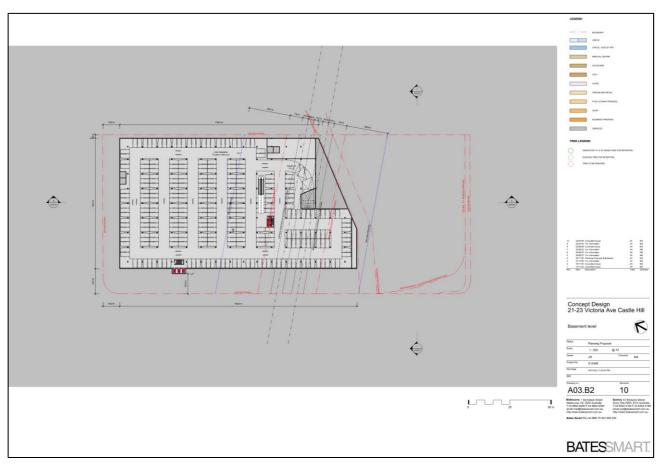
Proposed Architectural Plan (Basement Car Park)
